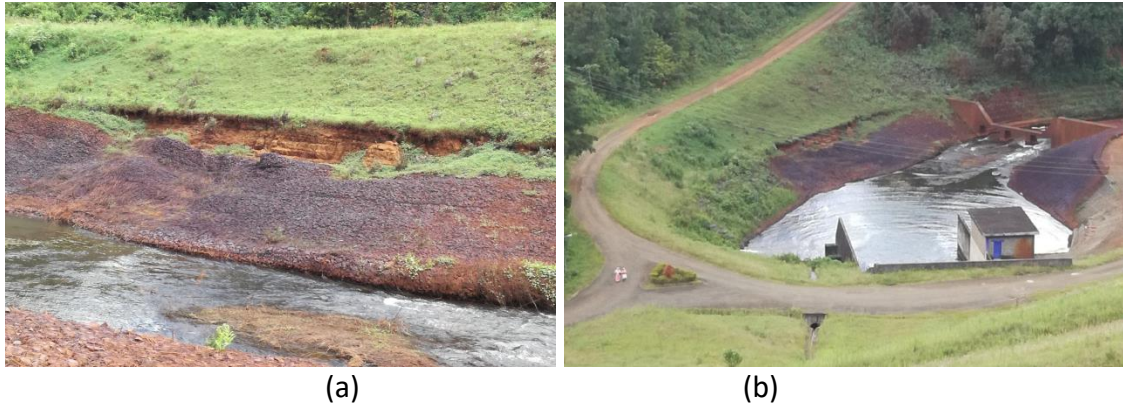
Damaged river bank protection at the outlet area of Thika Dam
